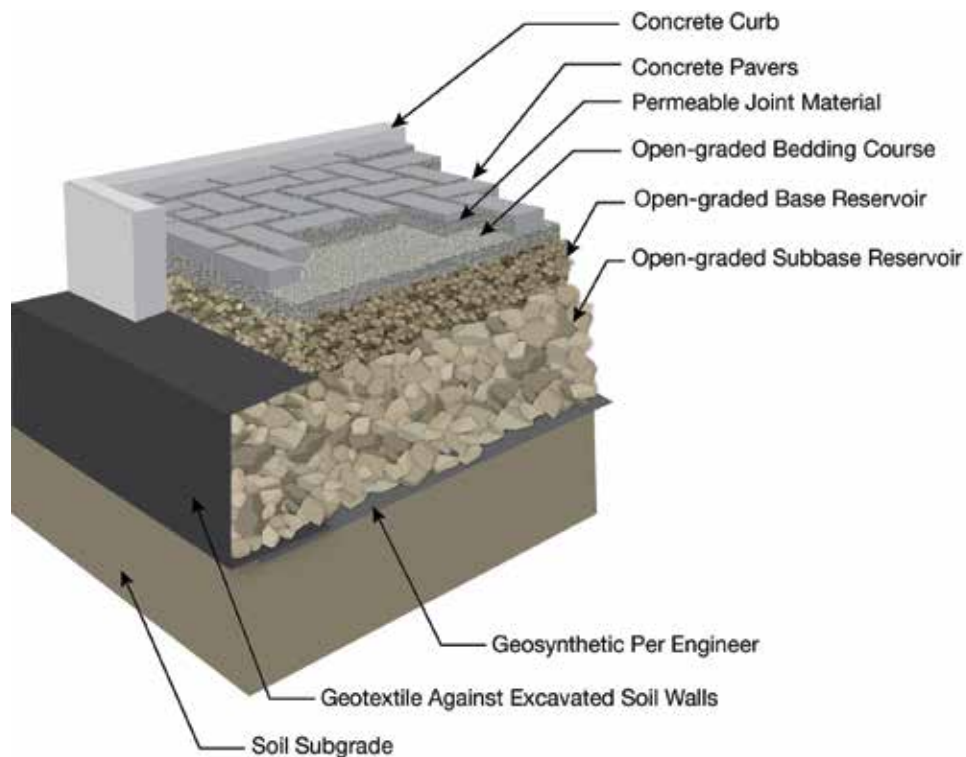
Full infiltration cross section allows storage and infiltration. Overflows are managed via perimeter drainage to swales, bio-retention areas or storm sewer inlets.
